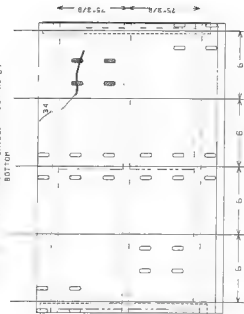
Bottom Cracking Pattern (Fourth Bridge - Test No 6)
